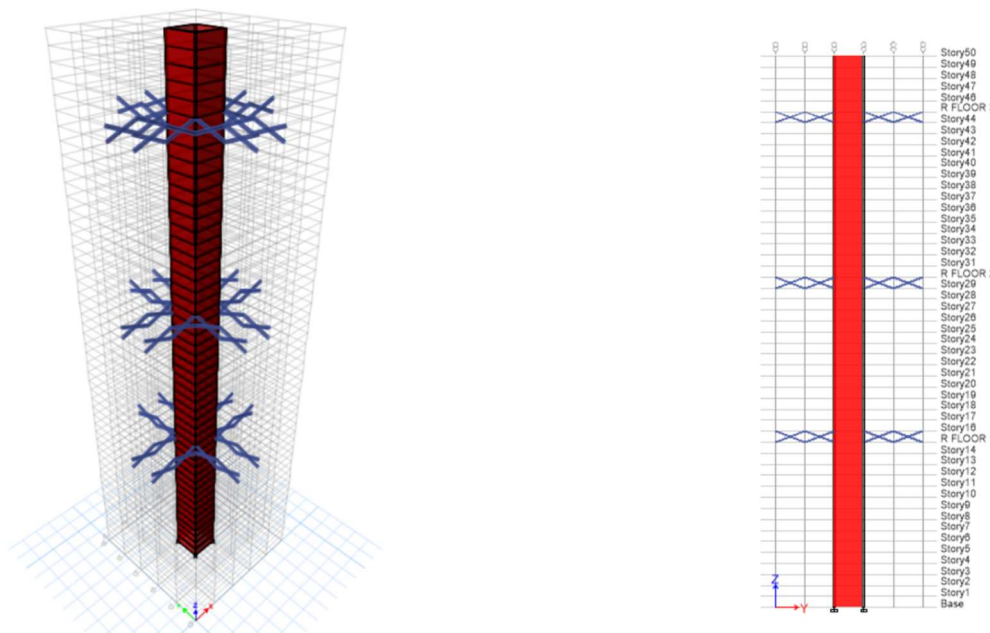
3D view and elevation of frame with centre core and outrigger.
